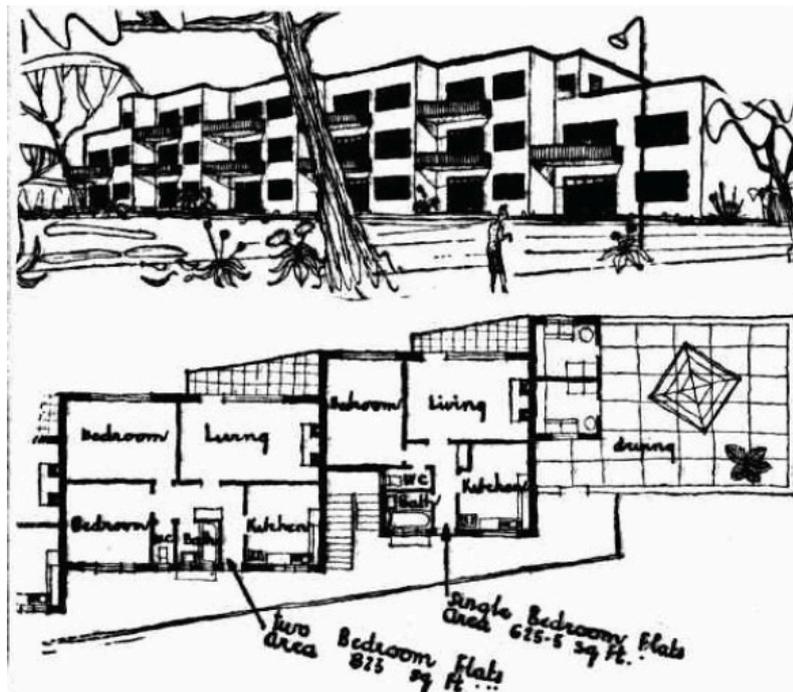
Type 'A' Flats elevation and plan (*The Argus*, 10 April 1947, p.14)
